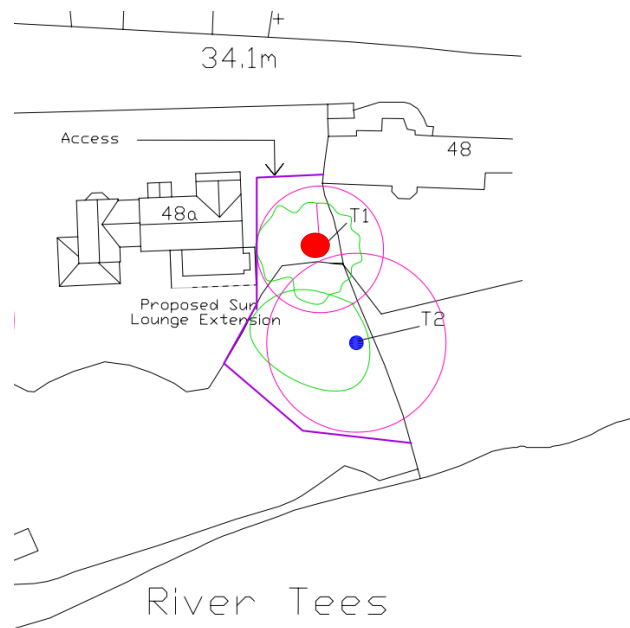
Tree Location Plan, T1 only is the subject of this assessment
